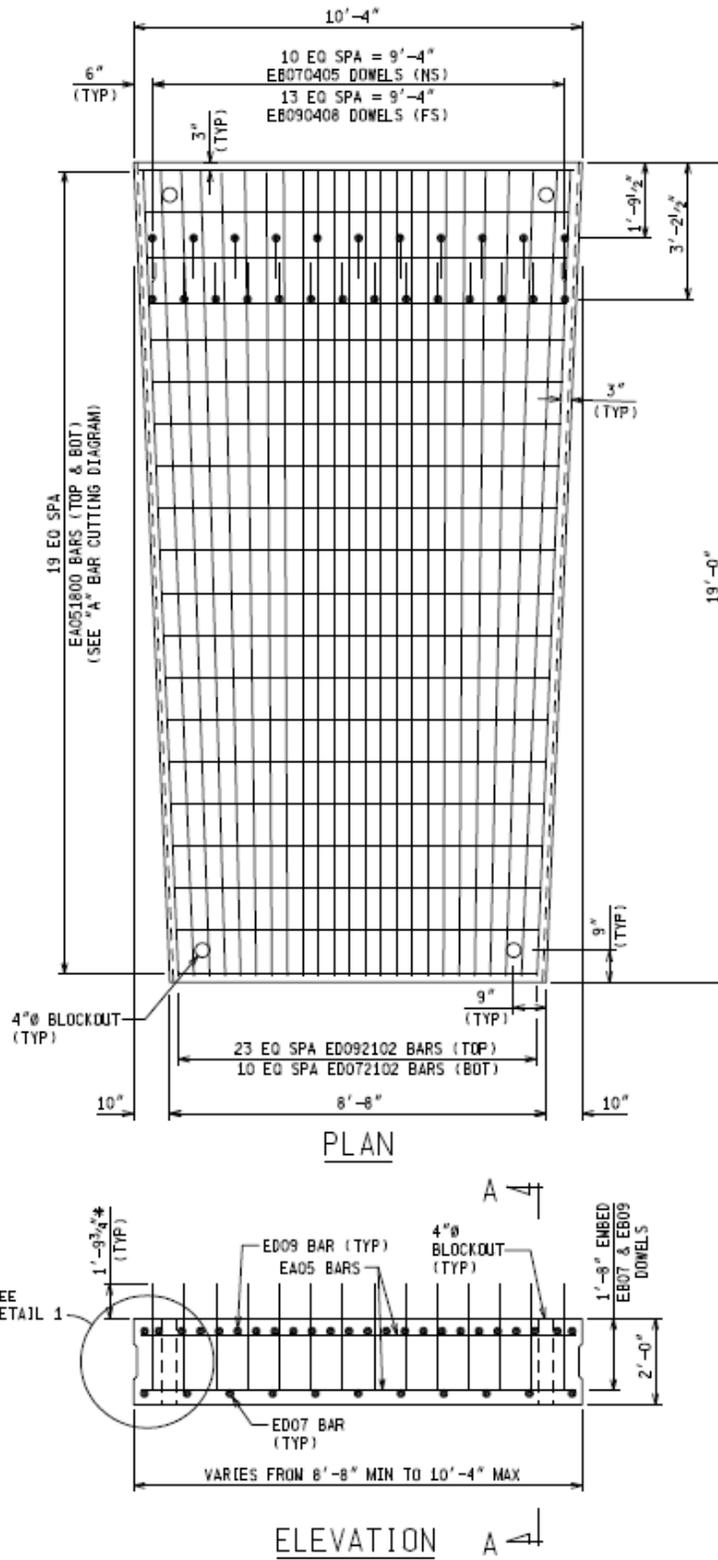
Trapezoidal Precast Footing Segment, Type 16 F
